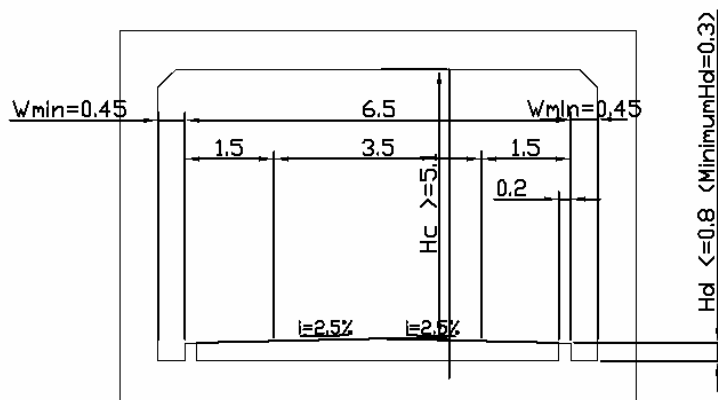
Details of Inner Box Culvert (Class-D Road)
